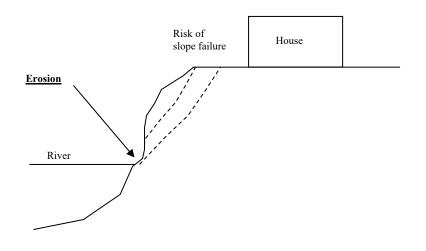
Cross-section of the investigation site with a house sitting next to the scarp (Source:
